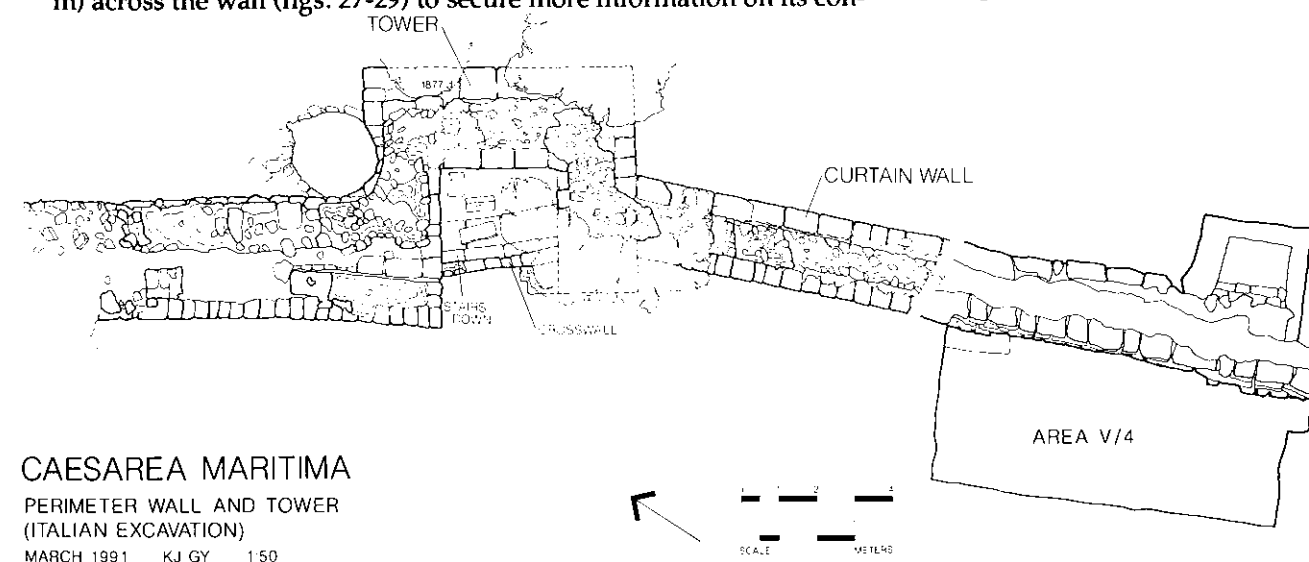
Area V, Tower excavated by Italian Mission, and trench V/4, plan.
